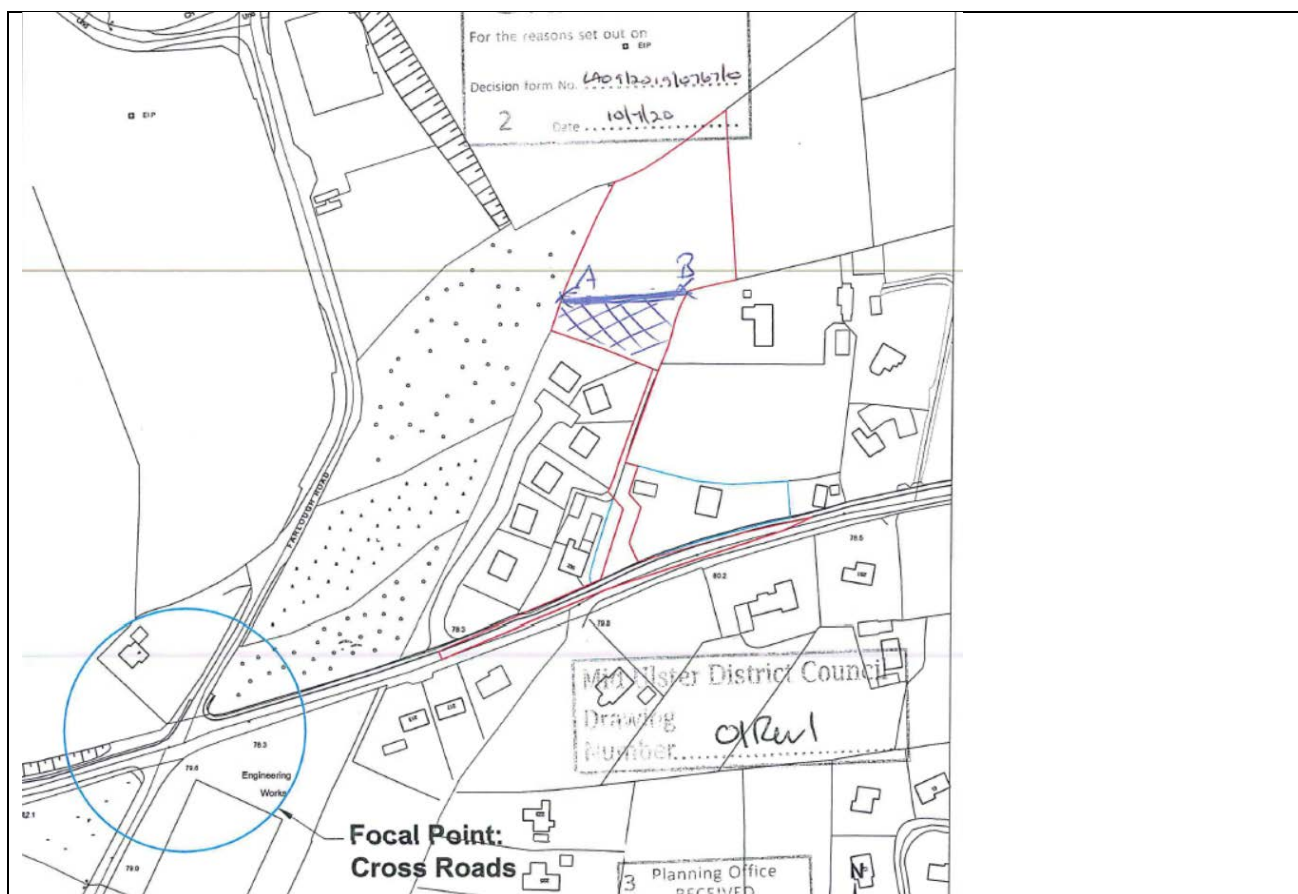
Screenshot of the stamped approved site location plan from LA09/2019/0767/O
